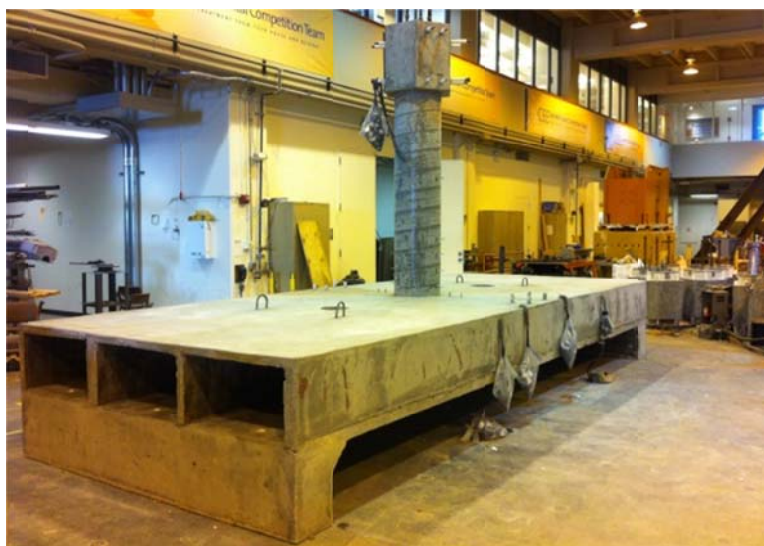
A view of one of the two constructed box-girder subassembly specimens after all formwork removal
